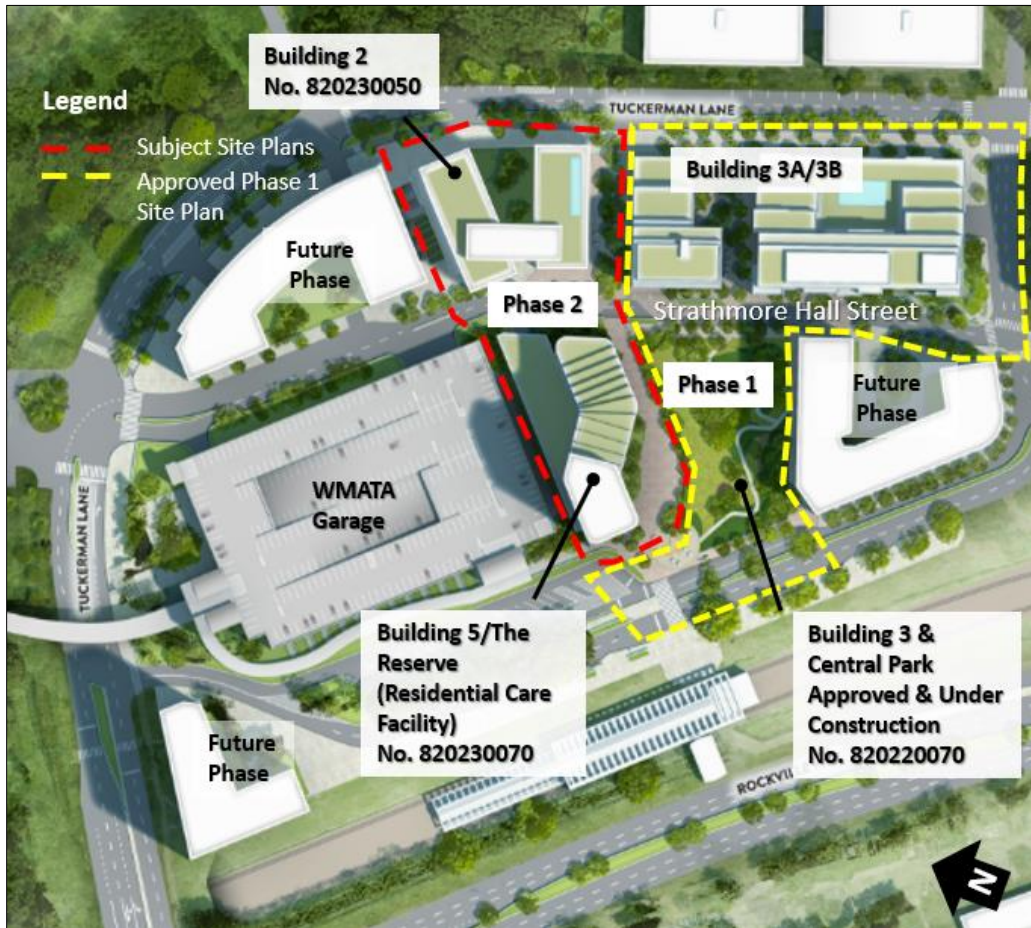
Illustrative Site Plan Showing Proposed Buildings 2 and 5 and the extent of the Phase 1 approval
